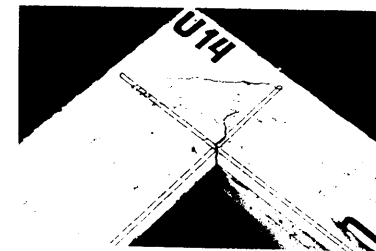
Corner Reinforced with Hairpins after Diagonal Tension Crack Failure
